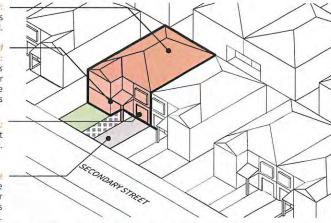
Typical Duplex - Duplex configuration articulated to break up building mass and create a scale similar to the adjacent residential buildings. The duplexes have direct pedestrian access to the building entrance and are placed close to the street while maintaining a setback matching the adjacent buildings.
